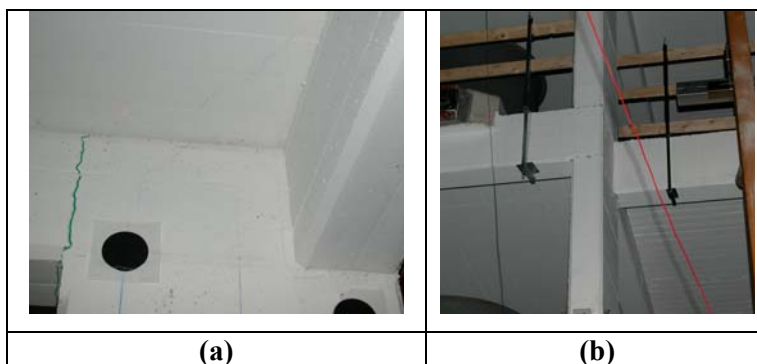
Cracks on column C6 at 1st floor (a) and 2nd floor (b).
